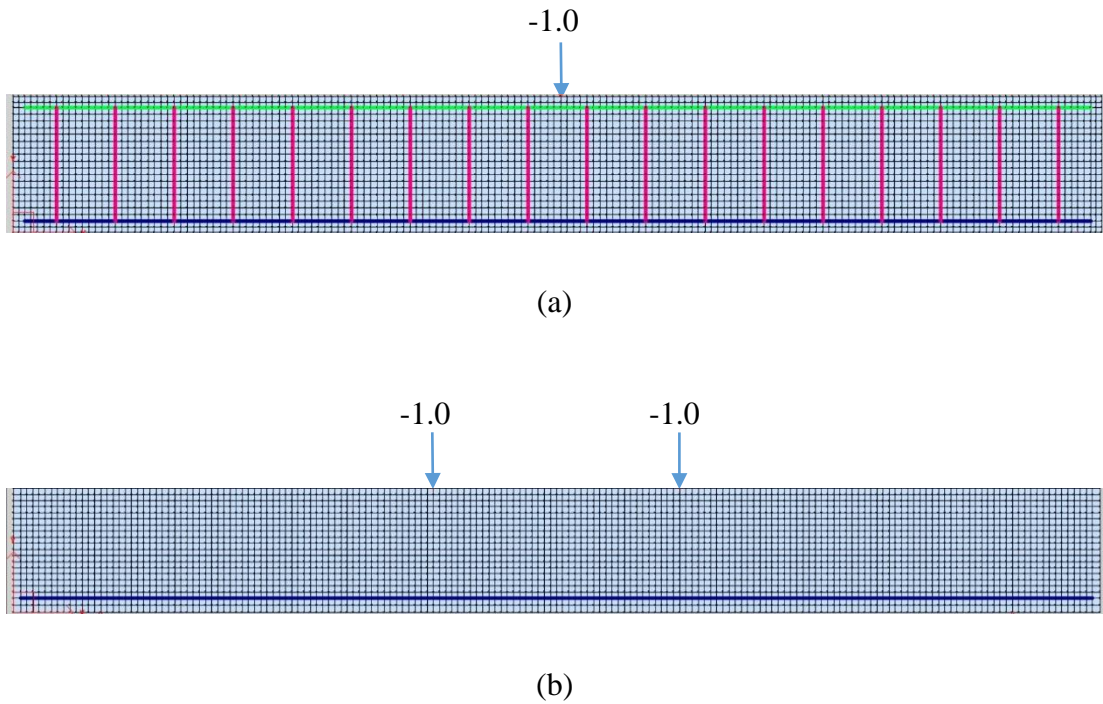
FE model of (a) reinforced concrete beam with stirrups (b) and fibrous concrete without stirrups
